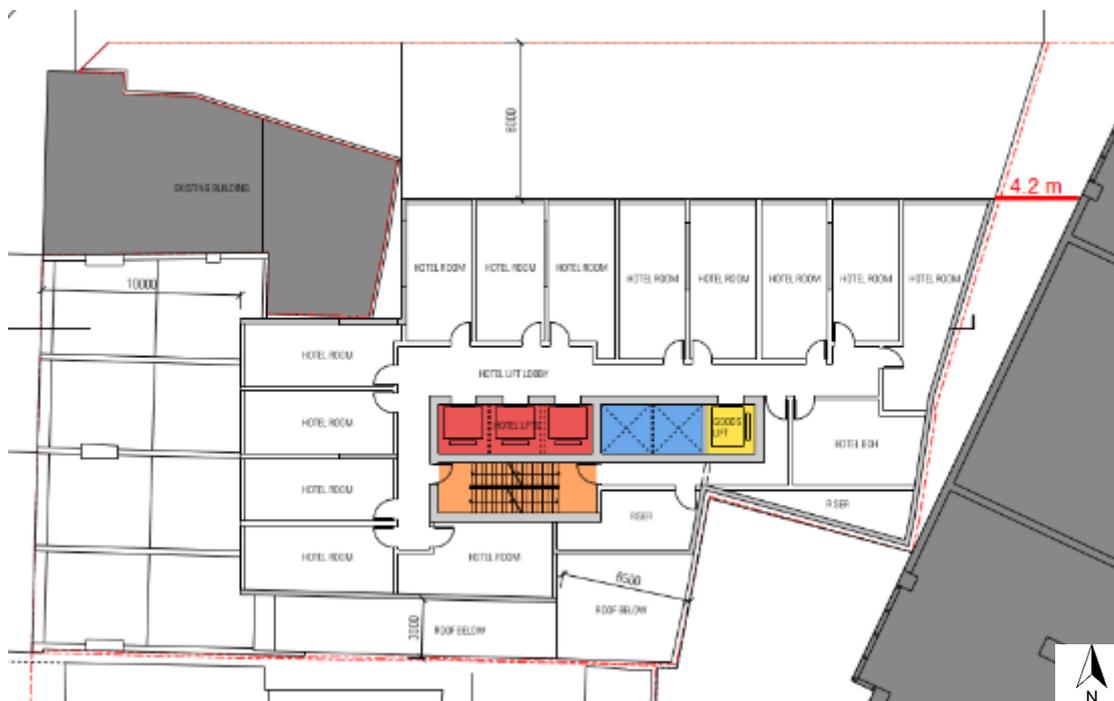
A 4.2 metre setback is provided between the eastern elevation and the commercial tower from ground level to the commercial tower, closest to Goulburn Street, and a nearly nil setback towards the rear
